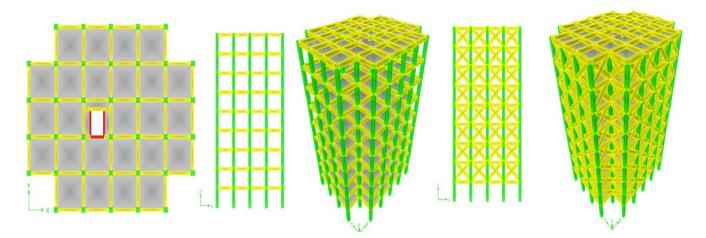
Plan, Elevation and 3D view of bare and infill frame for model-3 and model-4 respectively.
